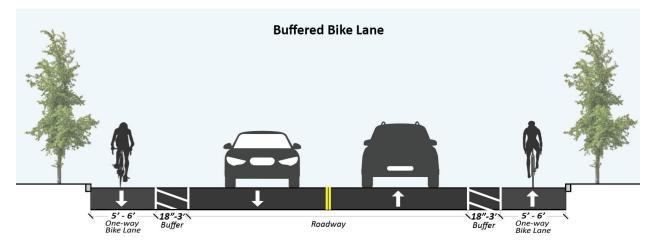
Example cross-section of a preferred buffered bike lane facility.
